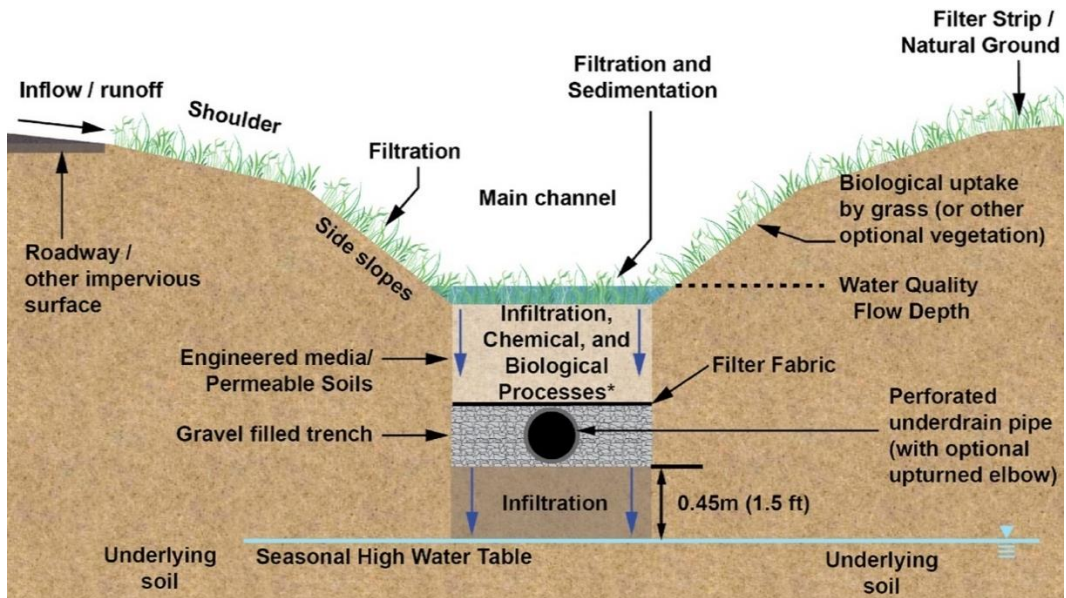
A typical cross-section of dry swales (Ekka and Hunt 2020)
